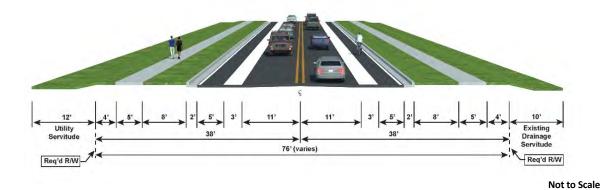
Typical Roadway Section, Urban Collector (UC-1): Midway Boulevard Two-Lane Roadway with Bike Lanes and Sidewalks
